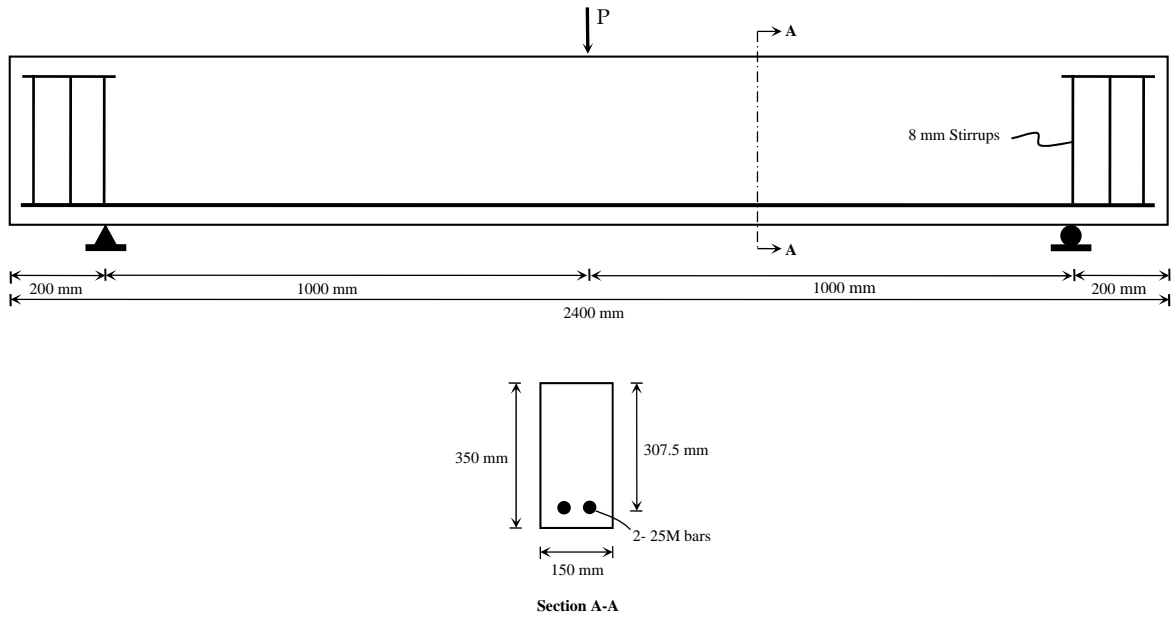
Beam specimen geometry and reinforcement details (pilot study)
